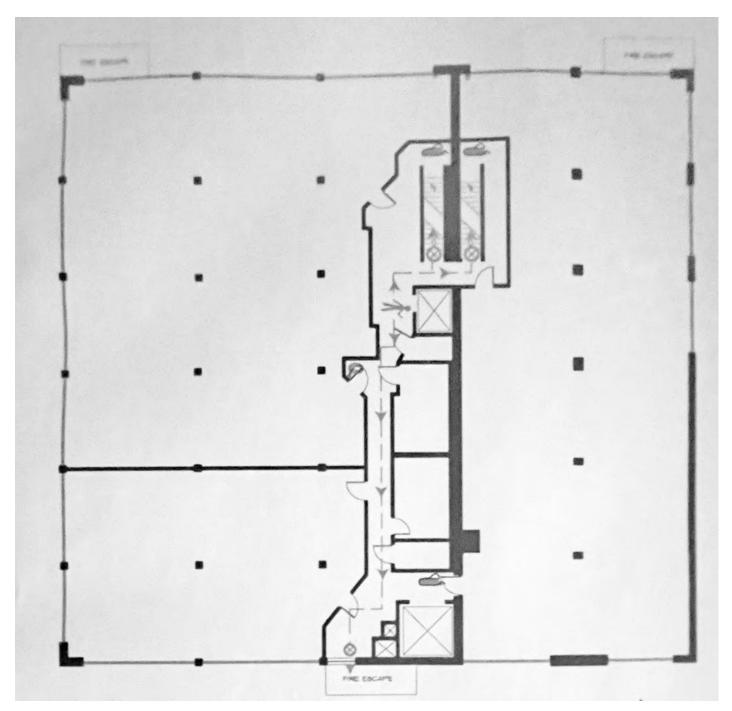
J.P. Smith Shoe Company Factory – First Floor Plan
